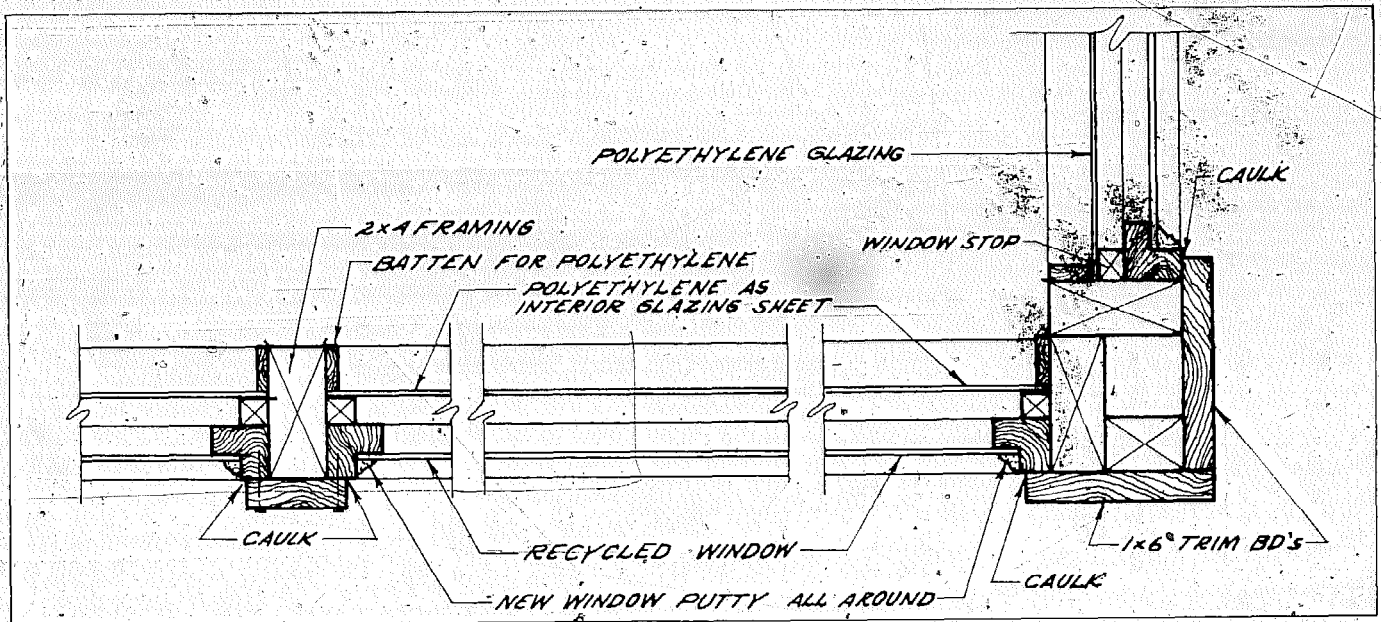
Corner plan showing recycled windows and polyethylene inner glazing
